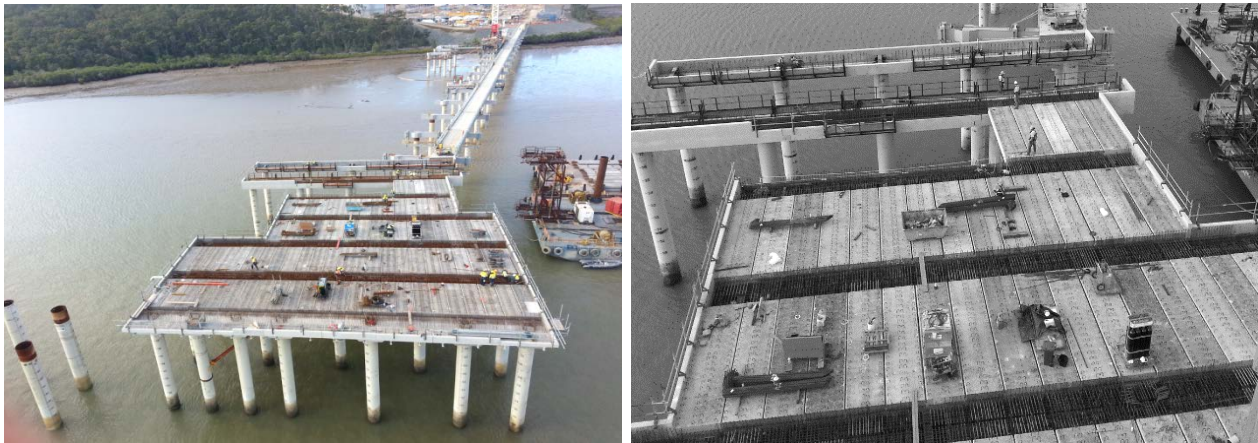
QCLNG Loading Platform. Left: Pile Caps and Part Installation of Primary Precast. Right: All Precast Installed and Crane Working from a Section of the Platform. @Arup
